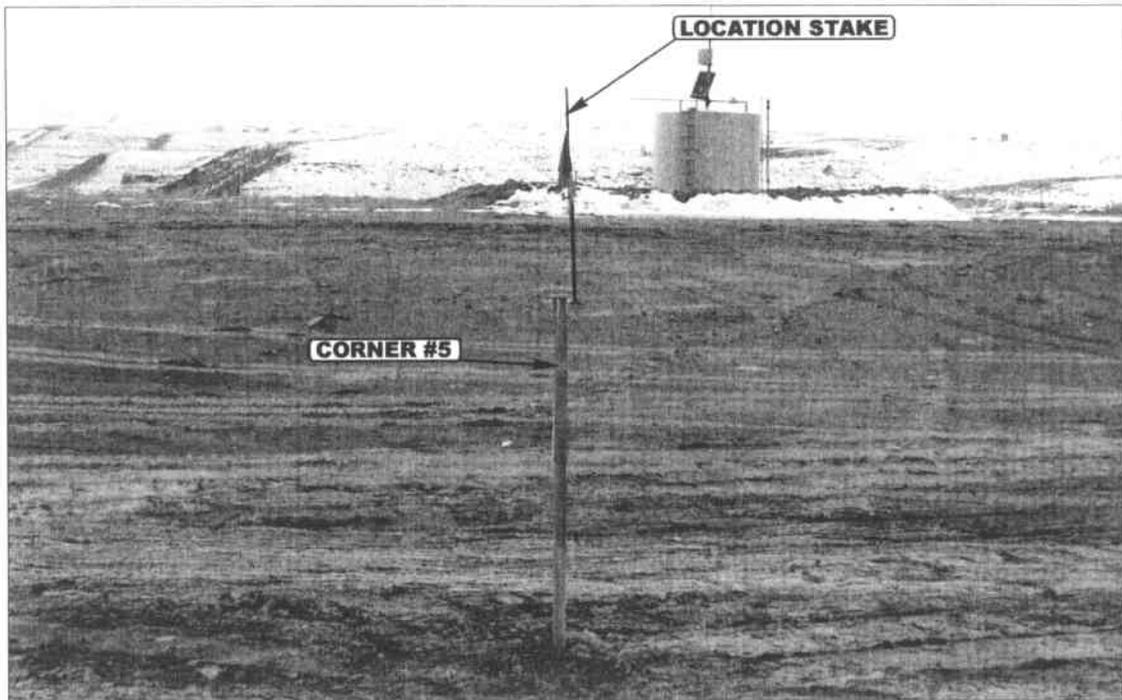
PHOTO: VIEW FROM CORNER #5 TO LOCATION STAKE
